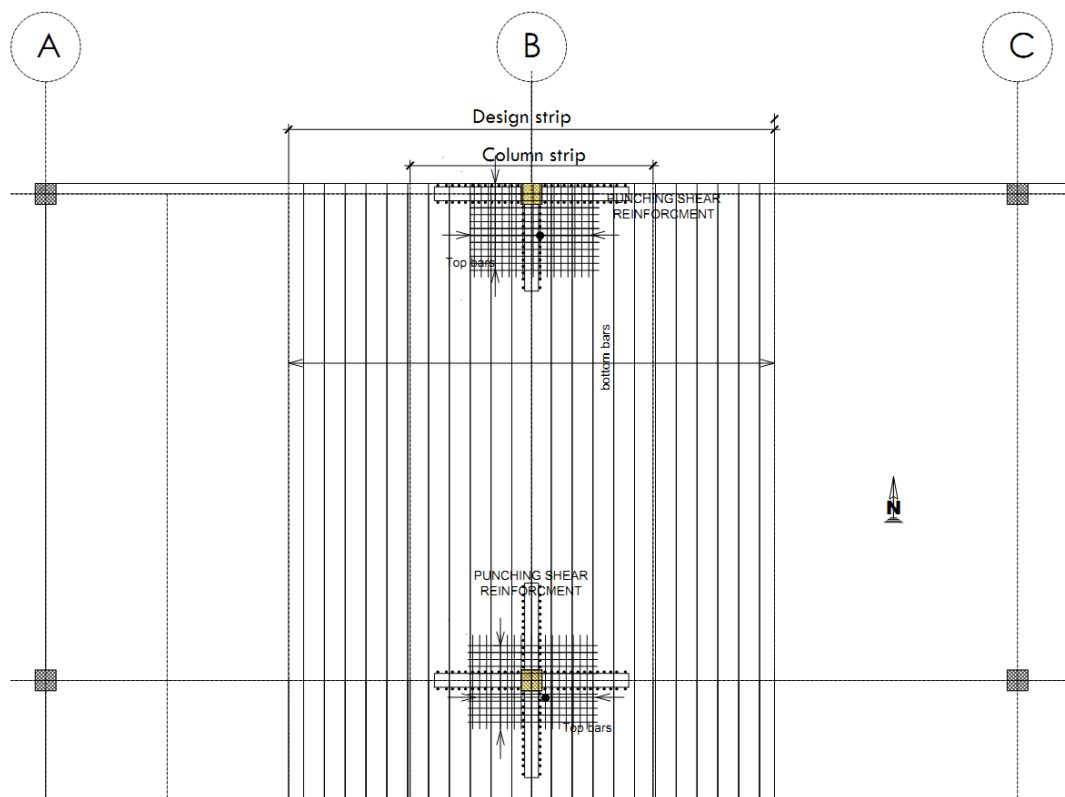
Typical reinforcement bar layout in NS-direction
